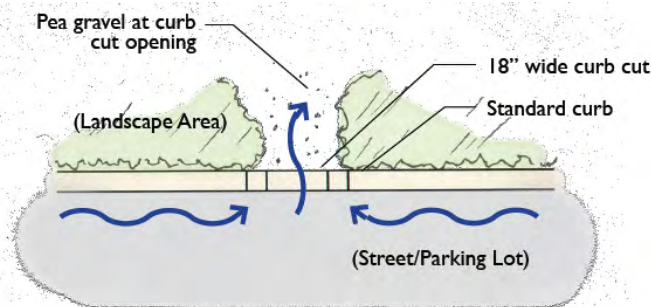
Standard curb cut: plan view (Source: SMCWPPP 2009)
